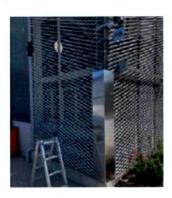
A: Proposed development facade design, ref.: Burns & McDonnell & Hyphen
